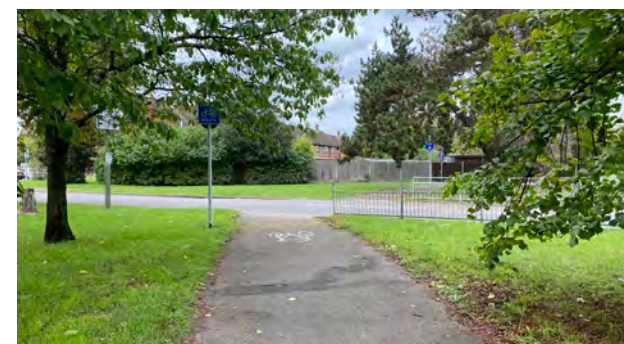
Existing shared use path on Woking Road to be upgraded to segregated cycle facility. New crossing of Stoughton Road required.
